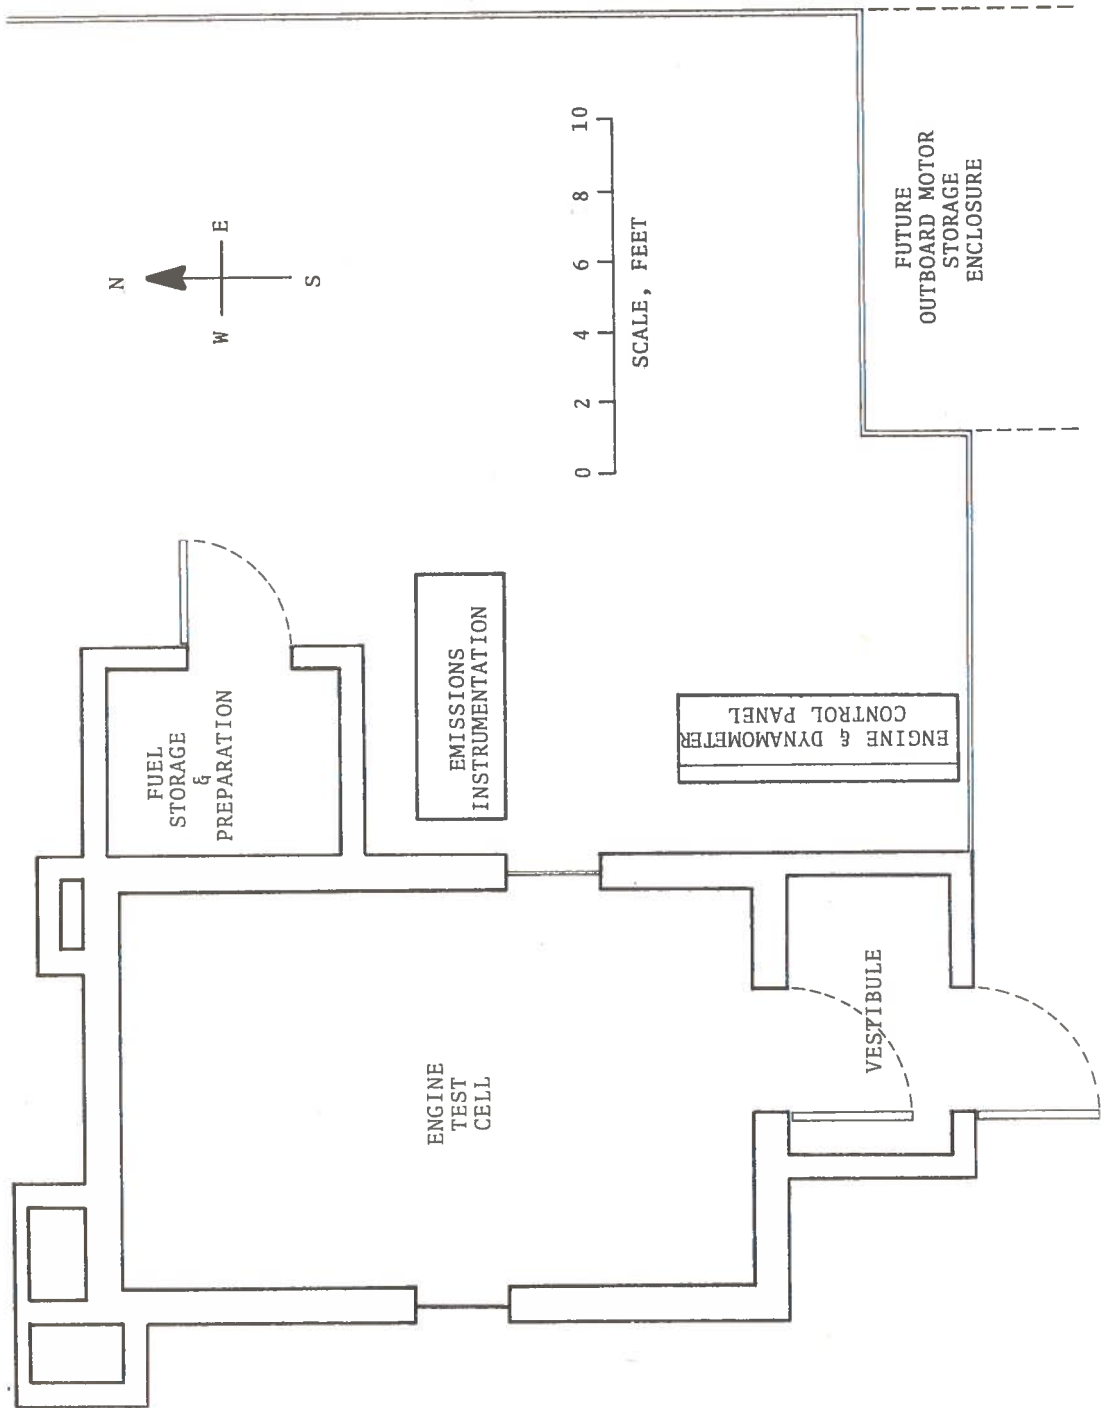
Floor Plan of Engine-Exhaust Emissions Test Cell
